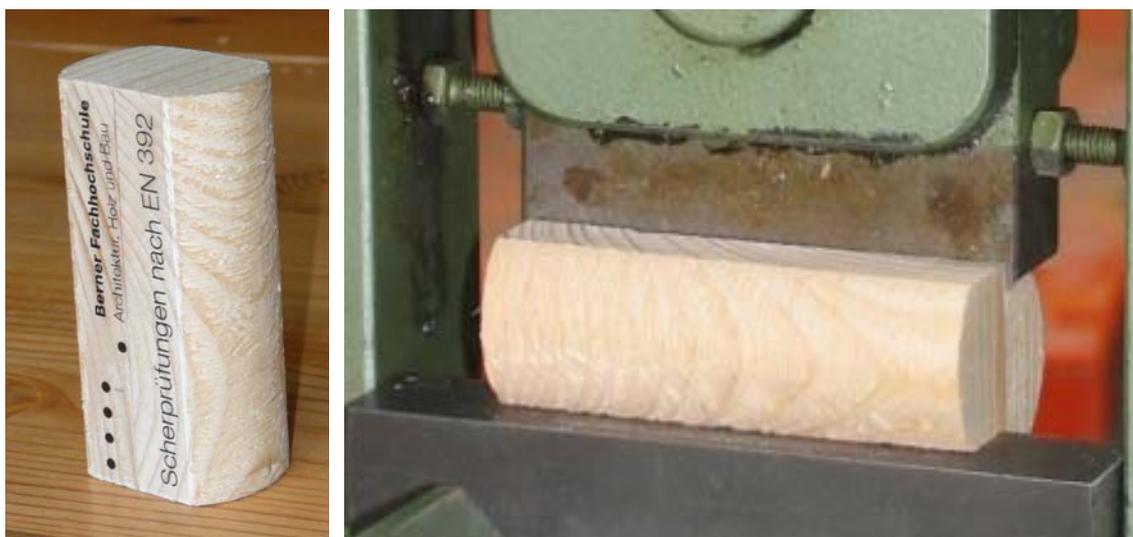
Shear core sample (left) and specimen in test fixture (right)
